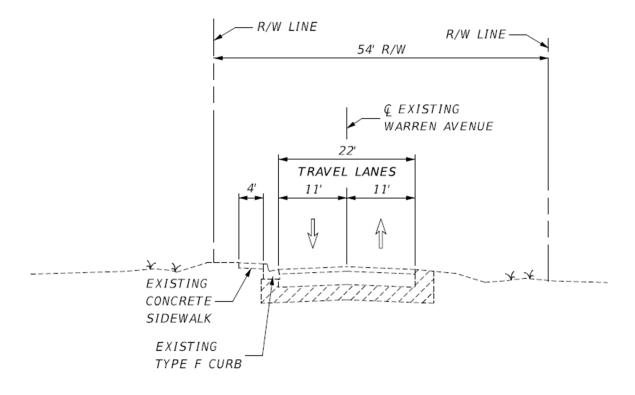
Existing Typical Section from 320 ft East of Lemon Lane to 680 ft West of Milwee Street
